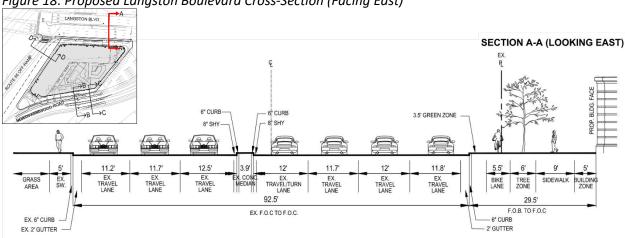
Proposed Langston Boulevard Cross-Section (Facing East)
